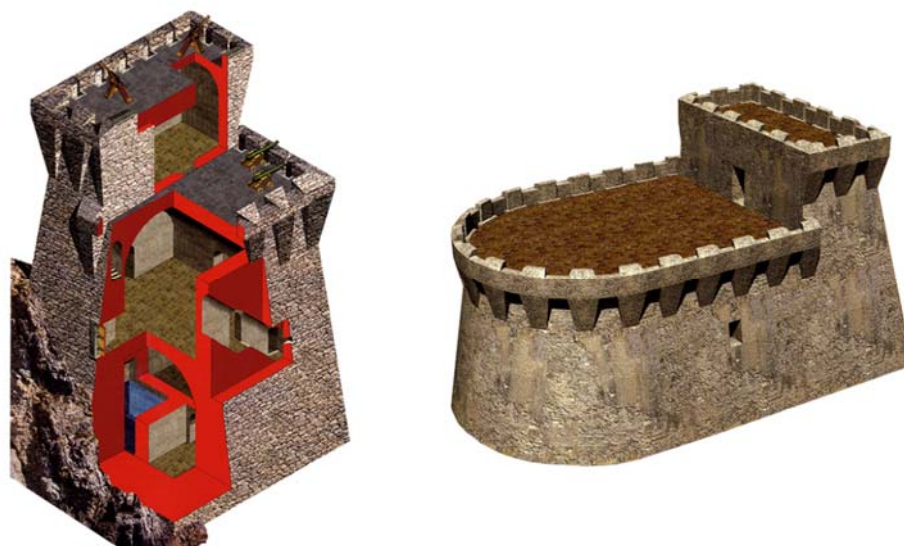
Tower with double height and enlarged tower. (Russo F., 2009)
